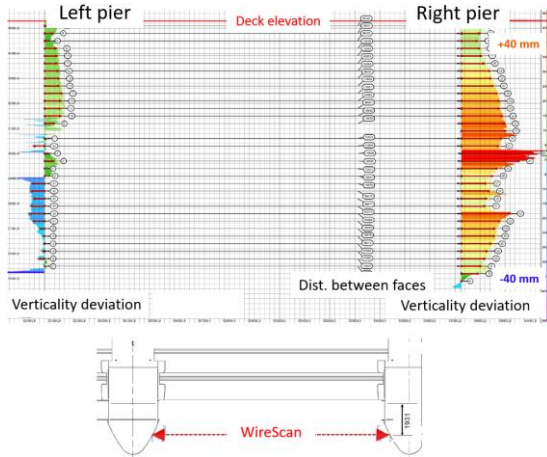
Measurement of the sealing surfaces, elevation view, La Gabelle.
